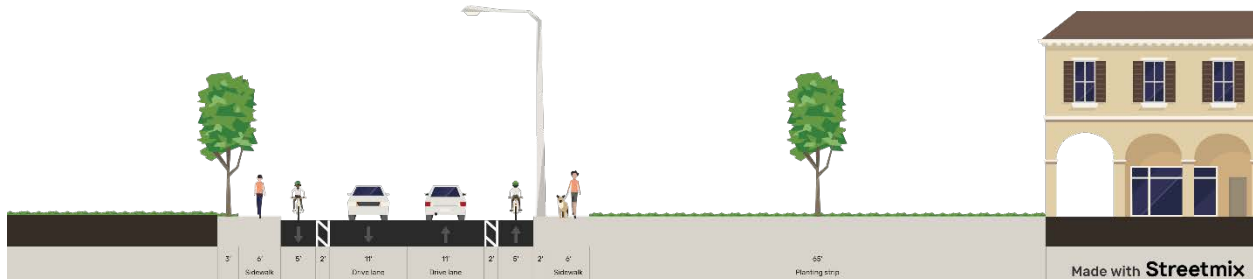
Street cross-section of Wheaton Street looking north from its intersection with Dundee Street. The street has two drive lanes and bike lanes on both sides of the street. Blackshear neighborhood residences are on the right and auto repair shops and the fire service establishments on the left. Diagram created in Streetmix by EC, 2022.
